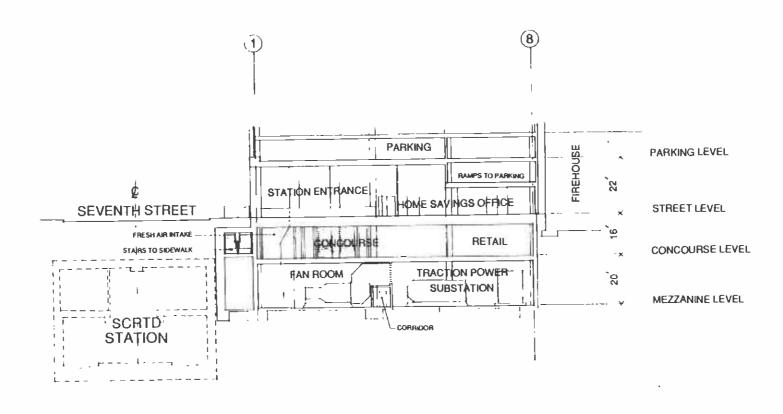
Description of Plan B No. 4 of 4 NORTH/SOUTH SECTION
